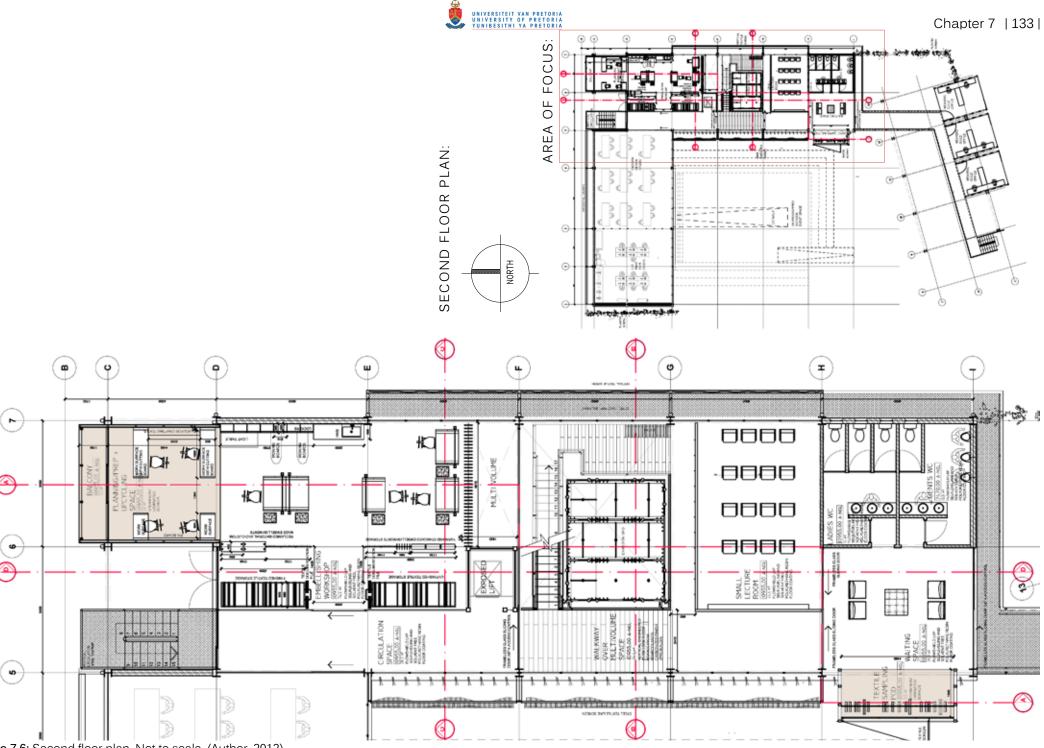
Second floor plan. Not to scale. (Author, 2012)
